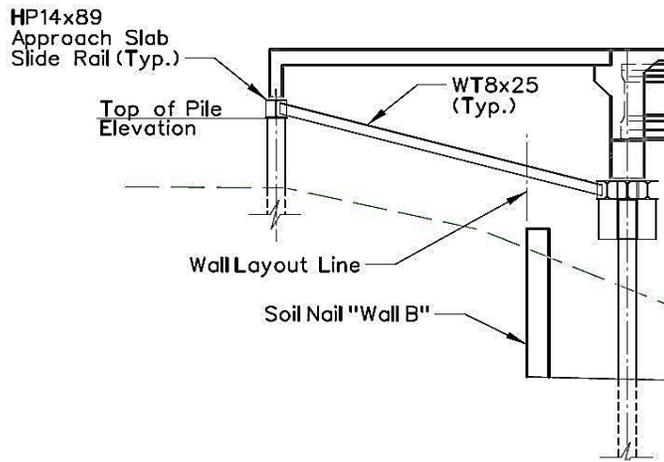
End view of the I-15 temporary substructure at the abutment and the end of approach with lateral bracing
